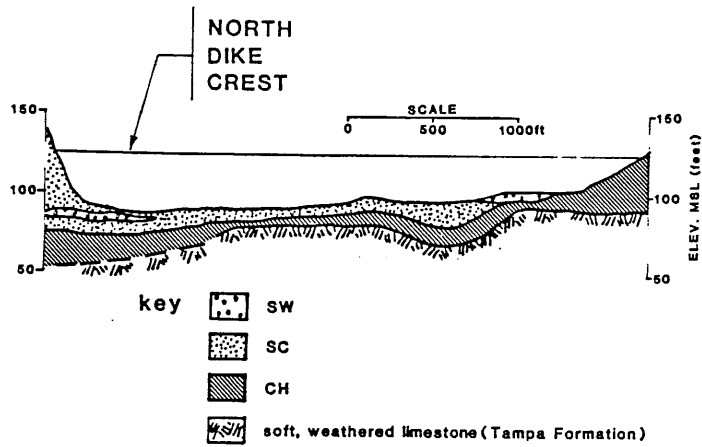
Subsurface Soil Profile, North Dike Foundation
